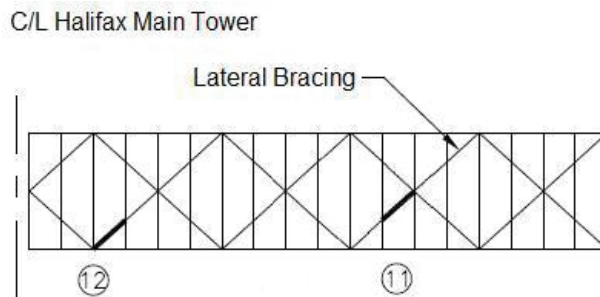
Lateral stiffening truss plan (adapted from B&T)
